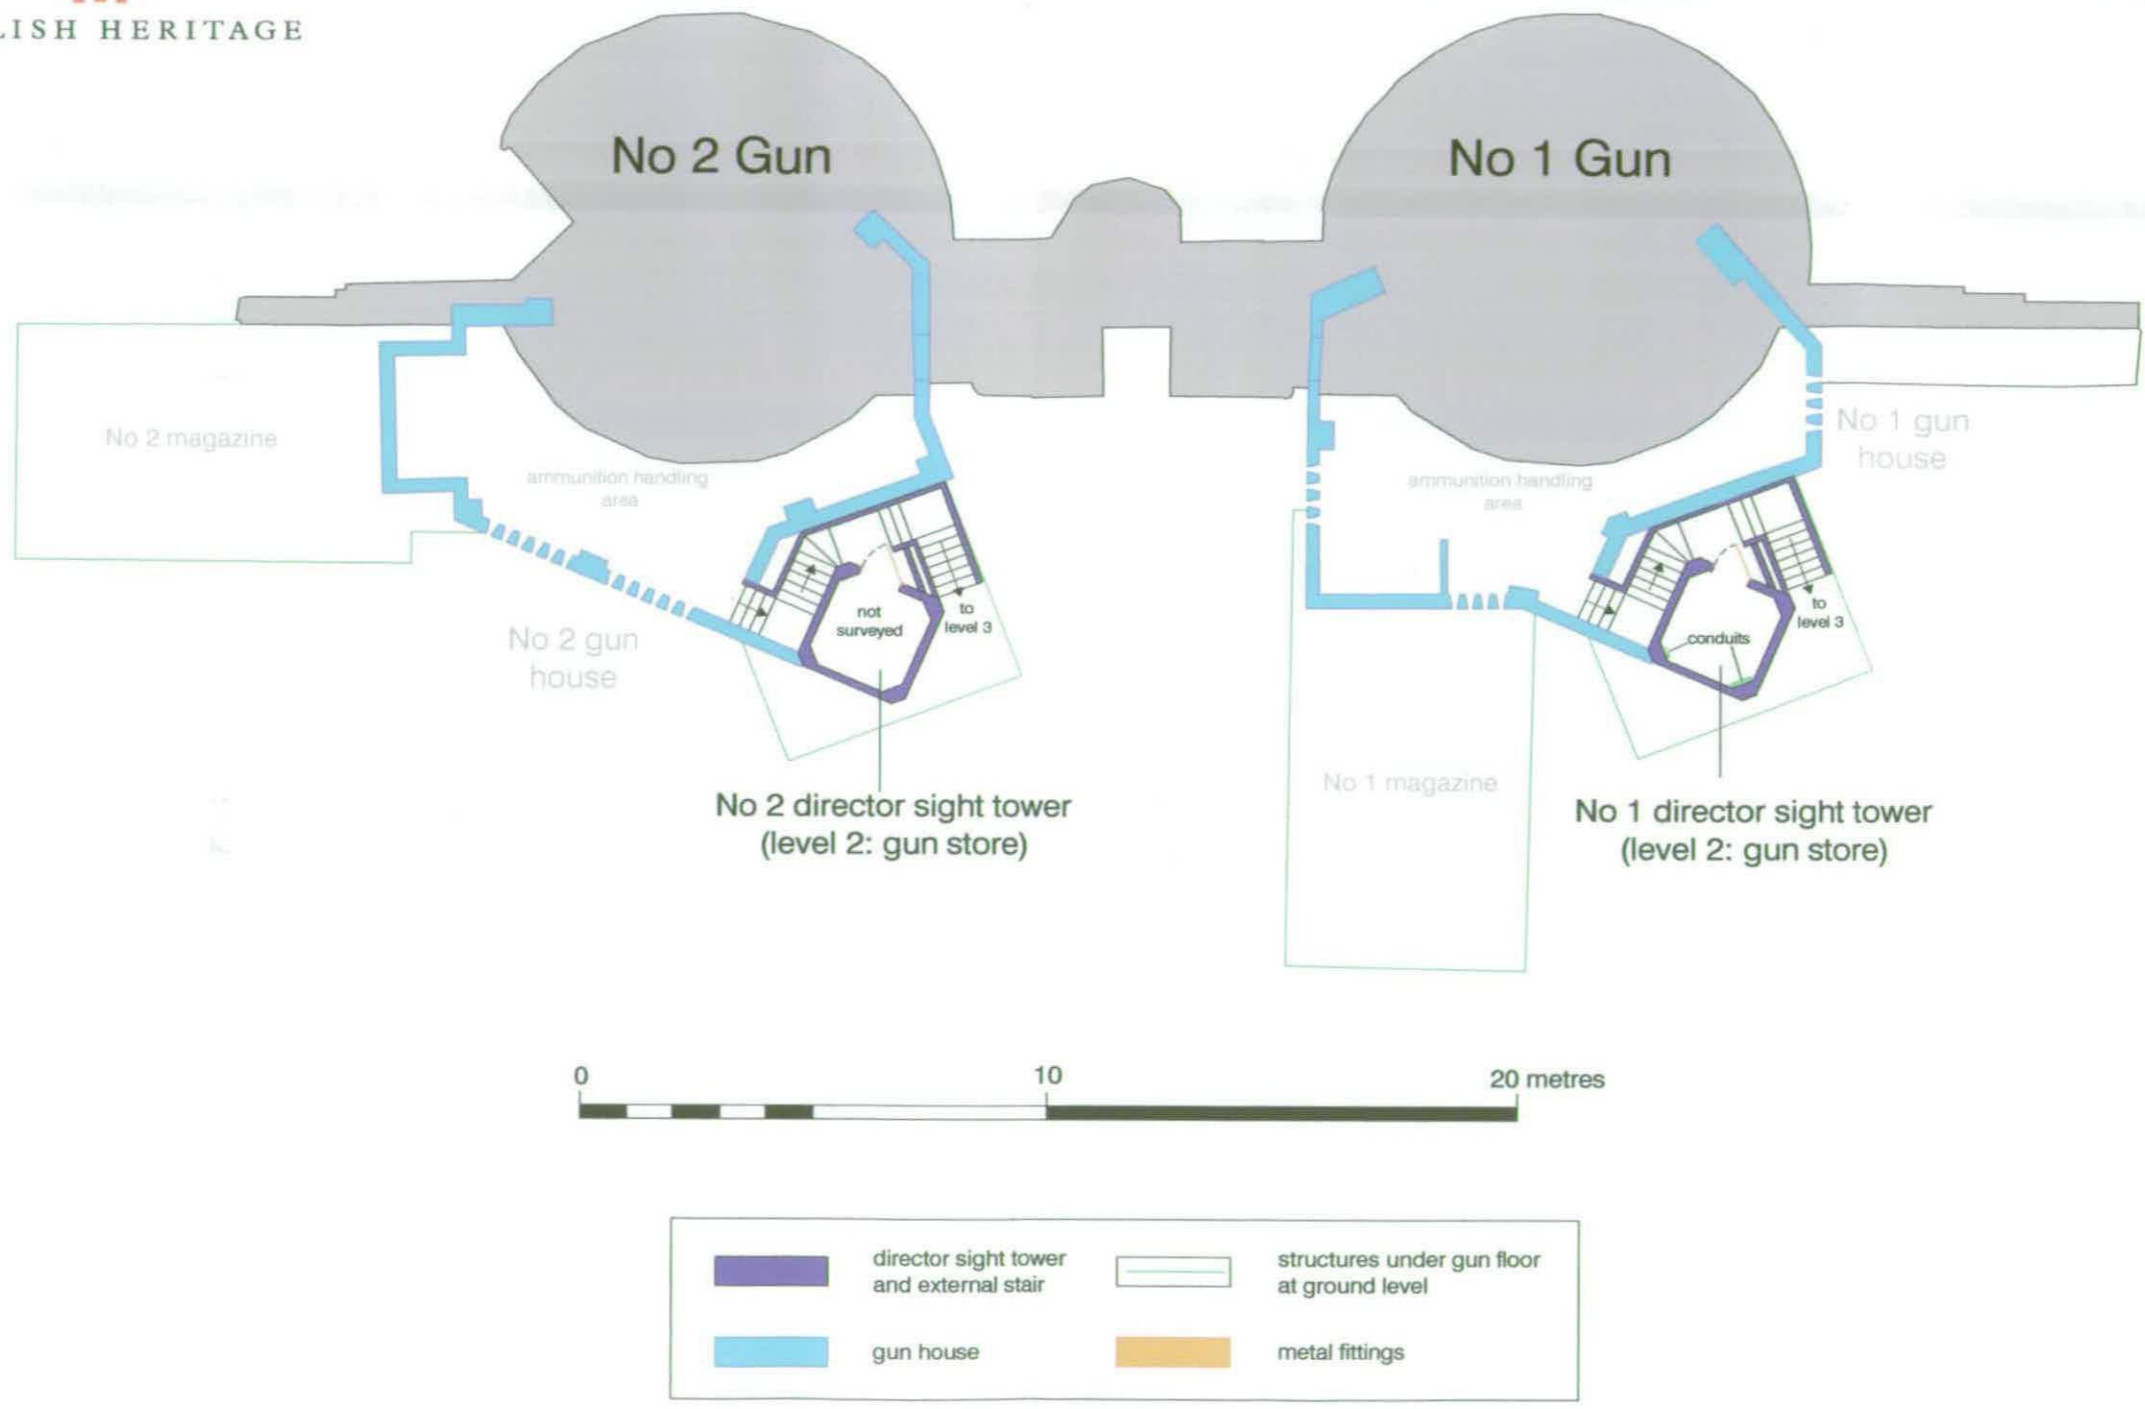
Darell's Battery twin 6-pdr equipment; detailed plan showing level 2 of the director sight towers
